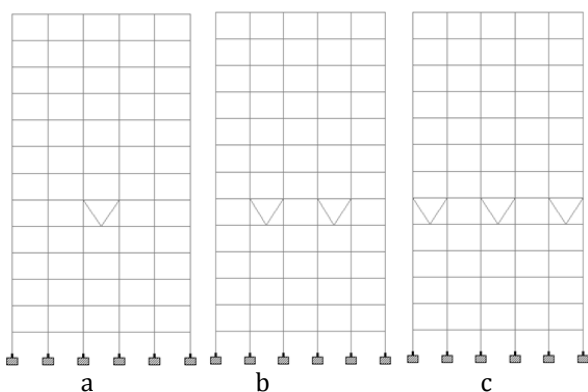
Optimum bracing pattern for 5-bay 12 storey structures, Fourth floor level braced.
